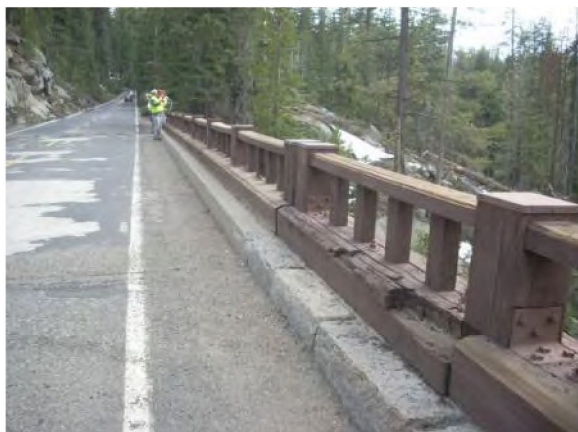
WOODEN BRIDGE RAILING IN DISREPAIR
